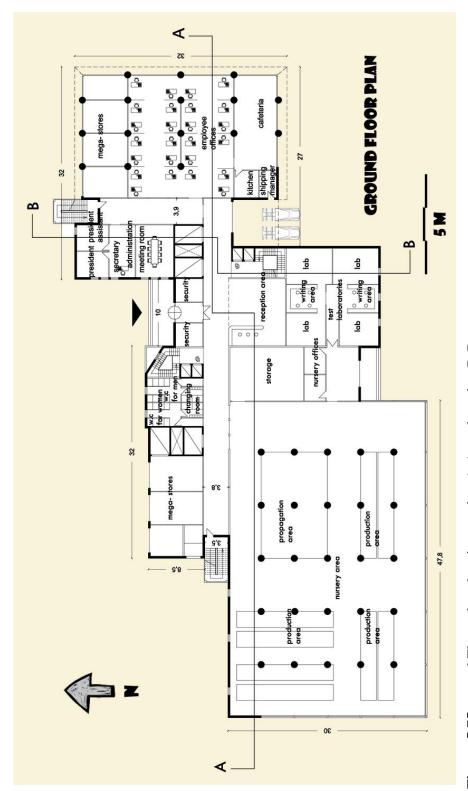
ground Floor plan showing section A-A, and section B-B
